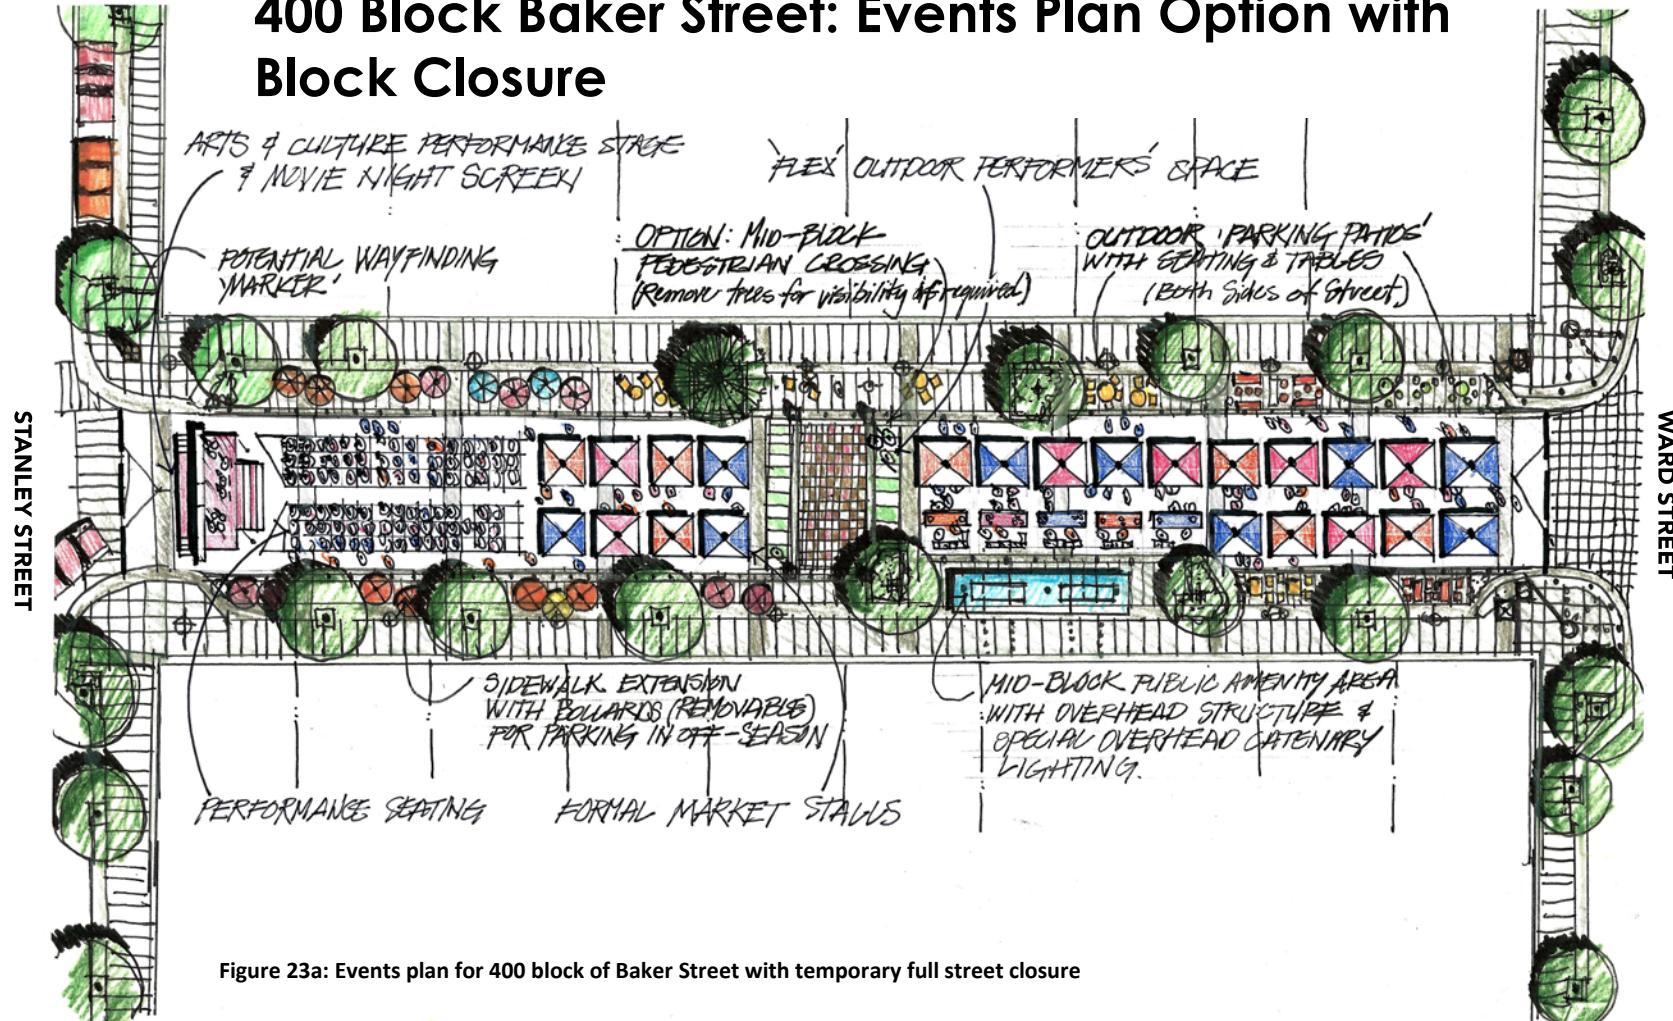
Events plan for 400 block of Baker Street with temporary full street closure
